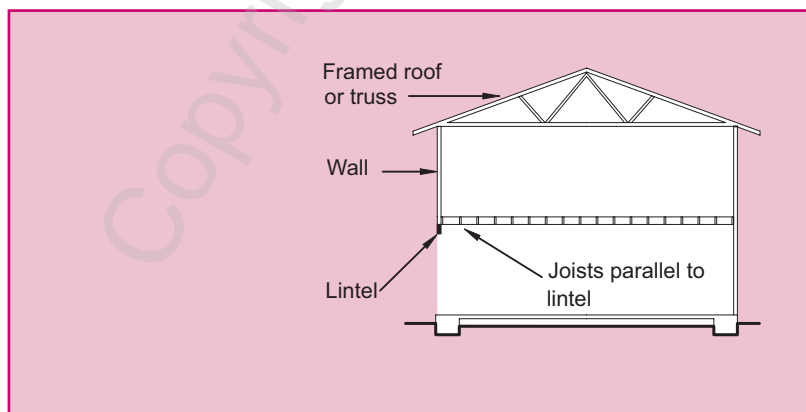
Lintel supporting roof and wall (see 8.6.1.1 and table 8.10)
